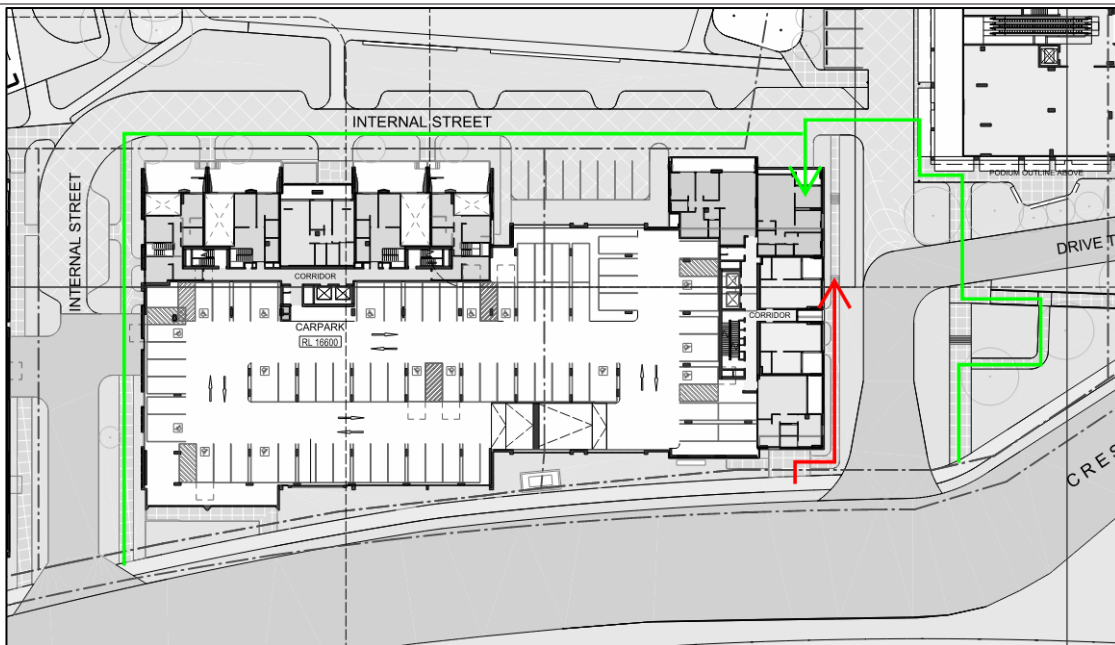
Accessway to Stage B – Building 4 from Crescent Street.
